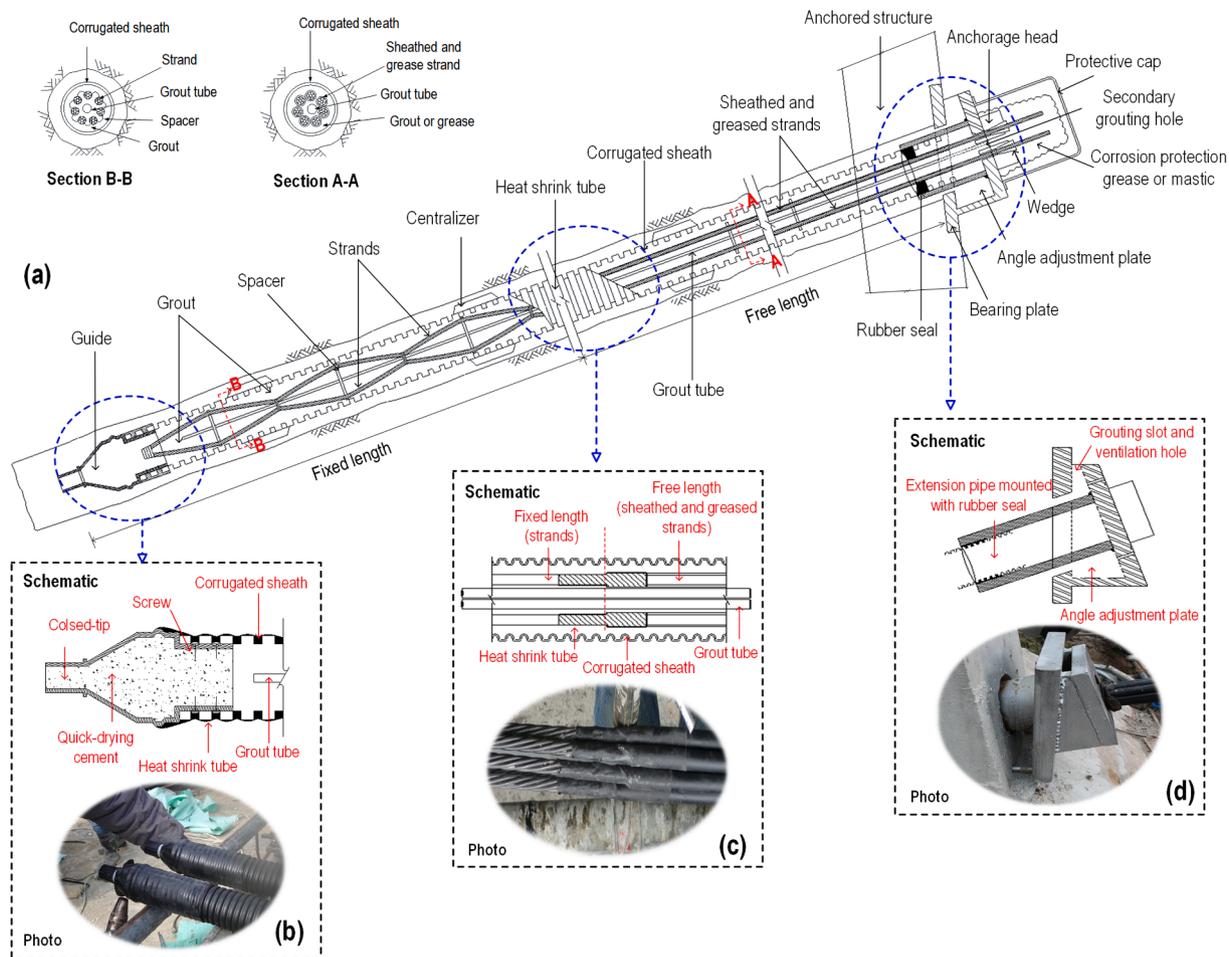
Production of the smart anchor: (a) schematic of the fully corrosion-protected production; (b) details and photo of the closed-tip strand assembly; (c) details and photo of the opening joint removed; (d) details and photo of the custom bearing plate assembly under the anchorage head.
